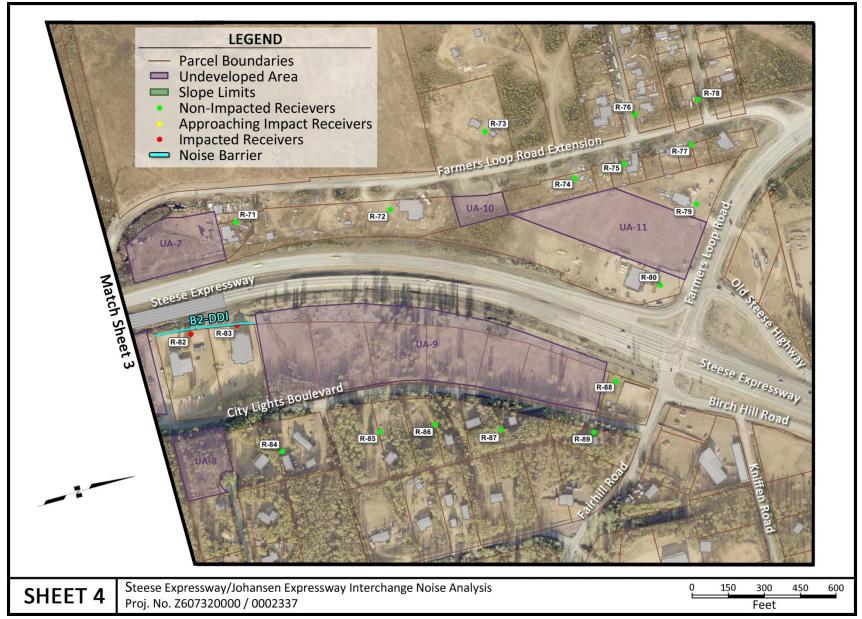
Diverging Diamond Interchange Noise Impacts and Proposed Barrier Walls, Sheet 4
